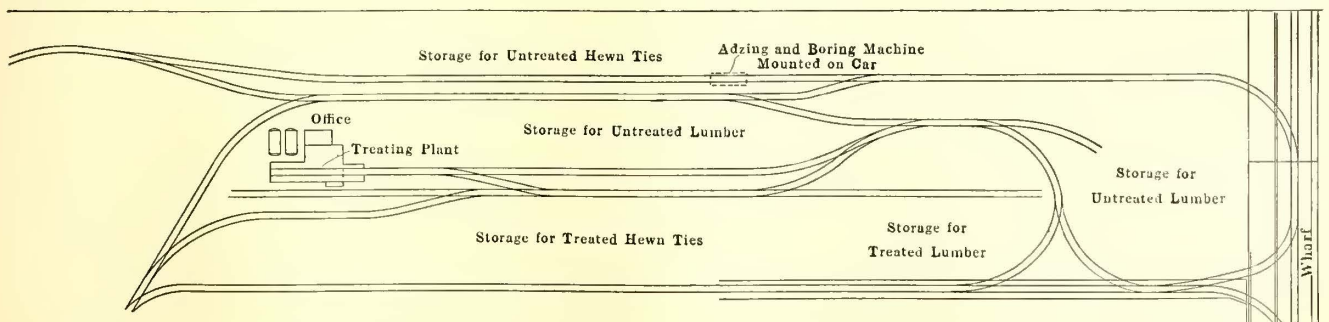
GENERAL LAYOUT OF TIMBER TREATING PLANT SHOWING RAIL AND WATER TRANSPORTATION FACILITIES
